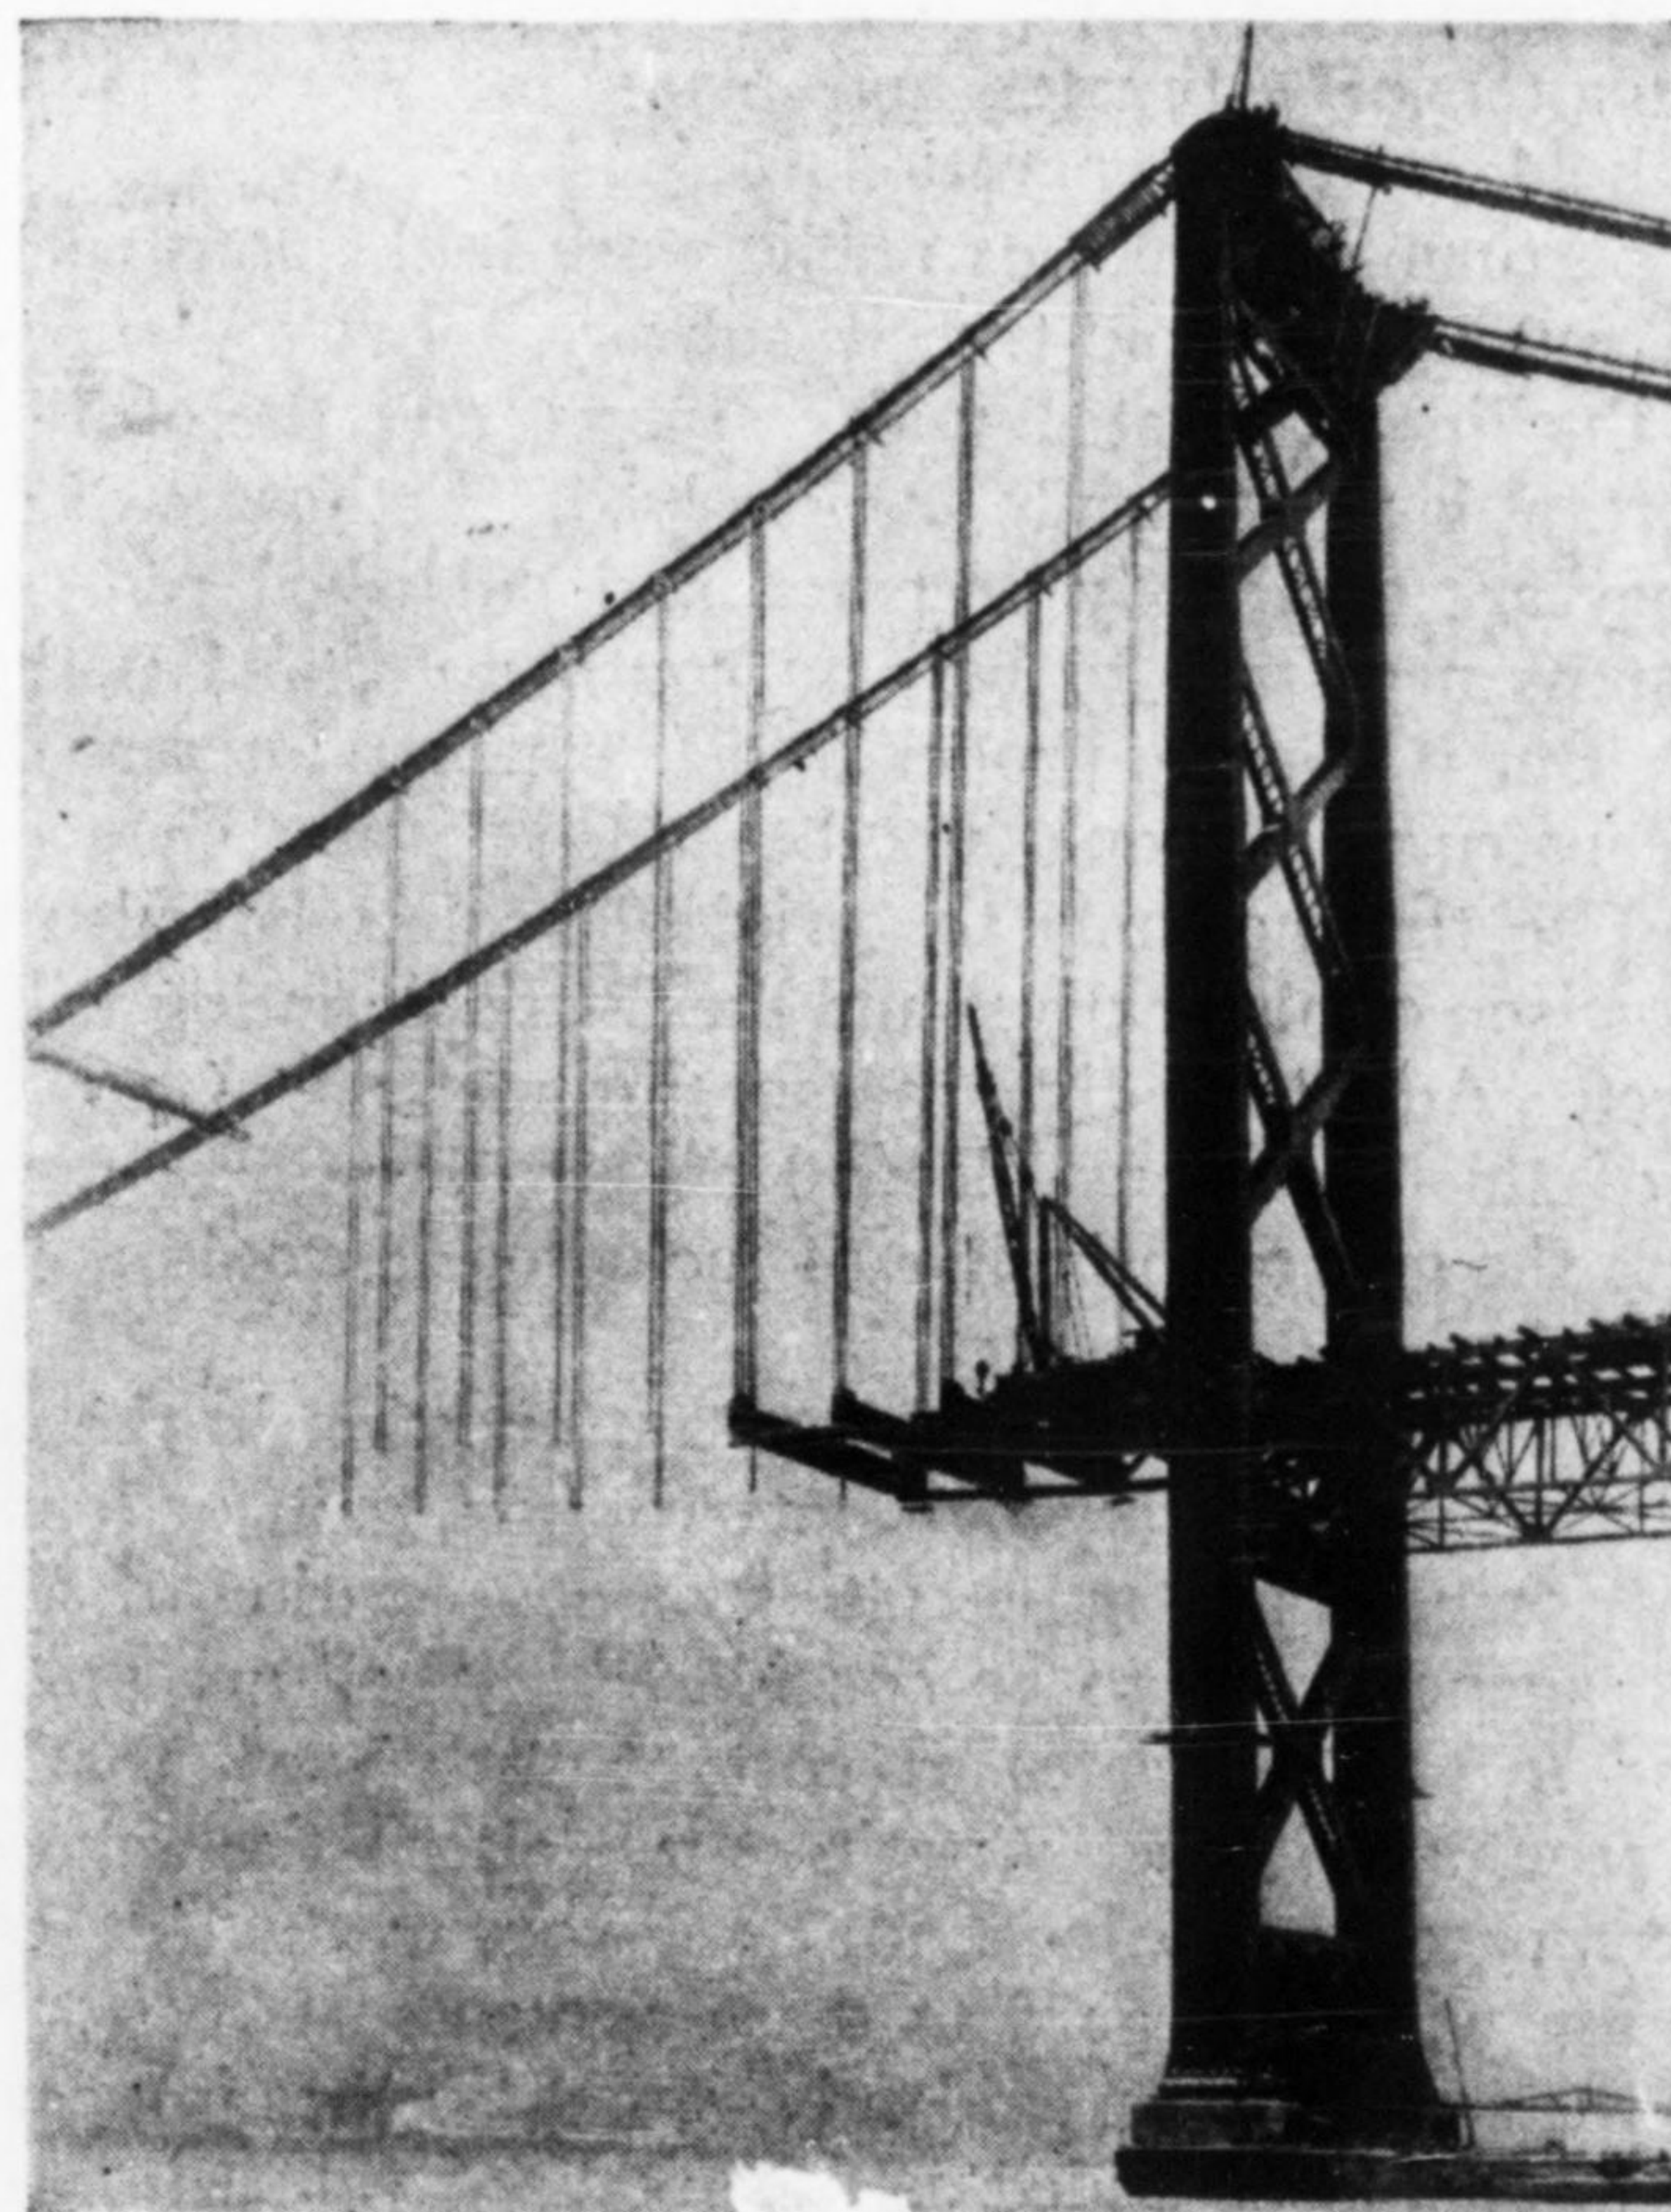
AMBASSADOR BRIDGE BEFORE DISMANTLING
